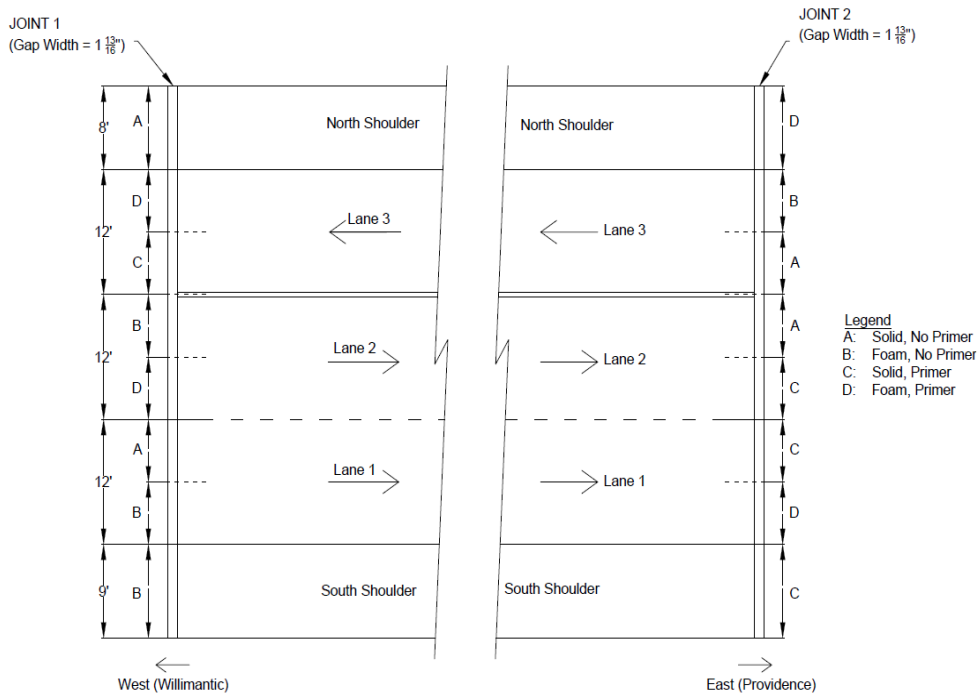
Sealant and primer placement plan, Route 6 Bridge
